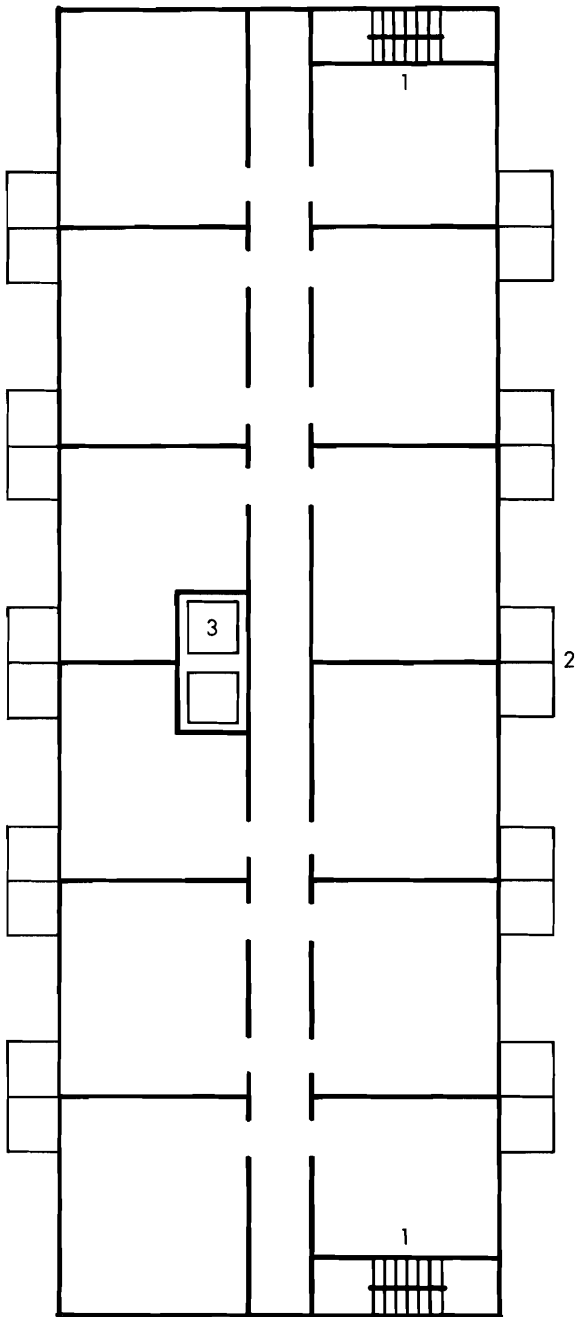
Typical Cross Section showing Areas of Refuge on Intermediate Floors
